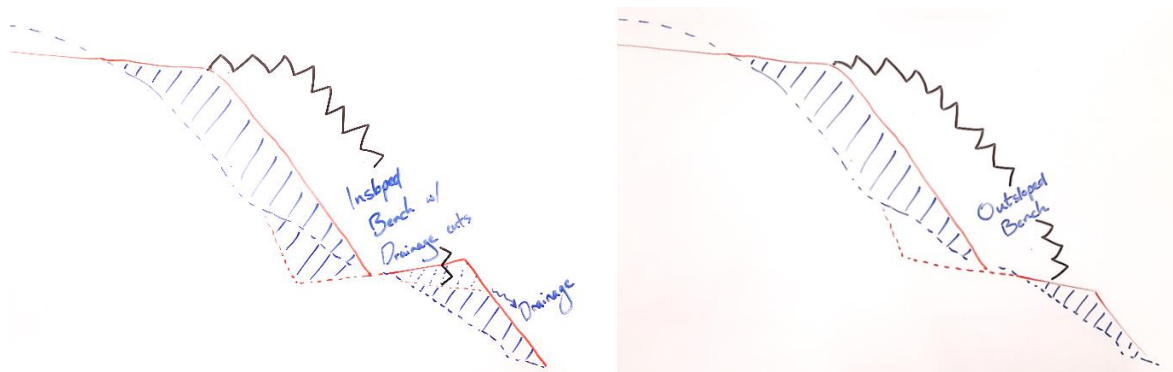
Example sketch of an in-sloped (left) and out-sloped (right) slash bench for the storage of residues adjacent to the landing.
